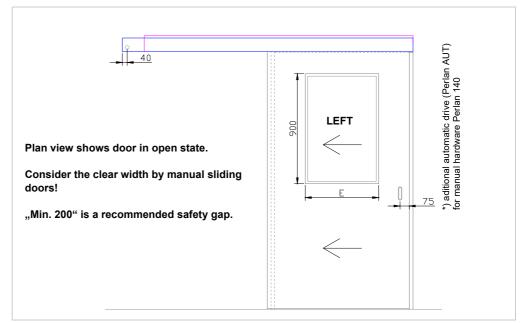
DS single-leaf door (J) with sliding mechanism, front view
